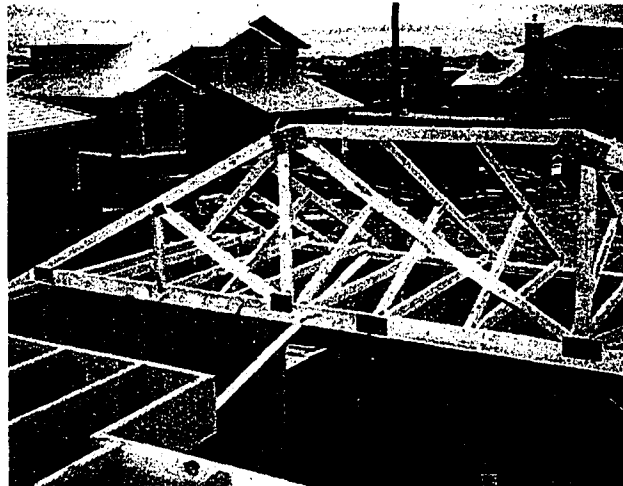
Use of prefabricated roof trusses (Lincolnberg International, 1994)
